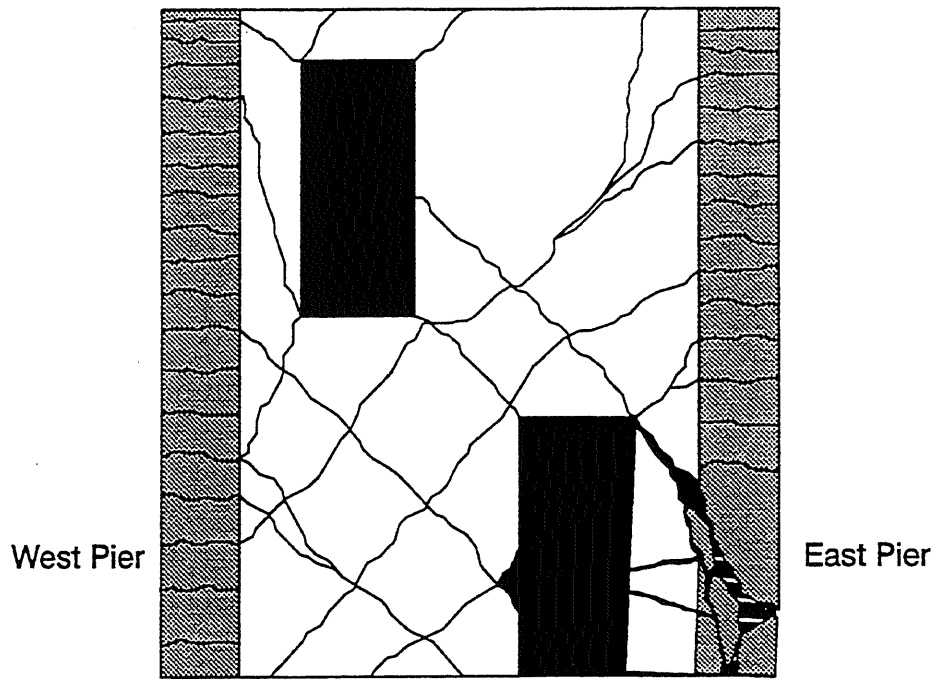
Crack Patterns in Wall W2 after Failure
